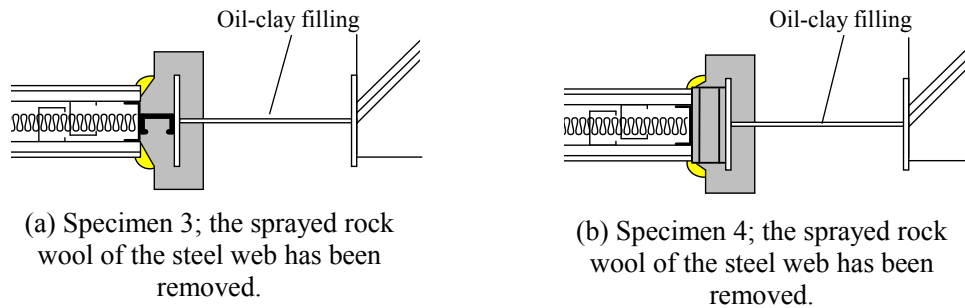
Additional specimens; sprayed rock wool of the steel web has been removed from specimen 3 and 4.
